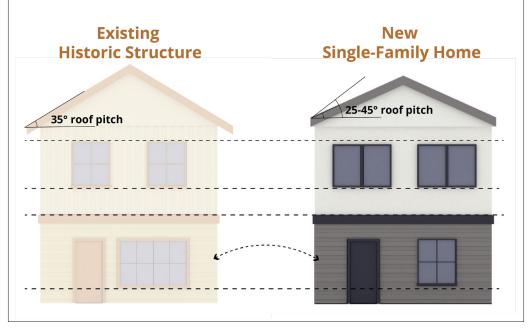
Historic compatibility standards, including similar roof pitch, parallel horizontal articulation, complimentary window proportions and shared façade materials.
